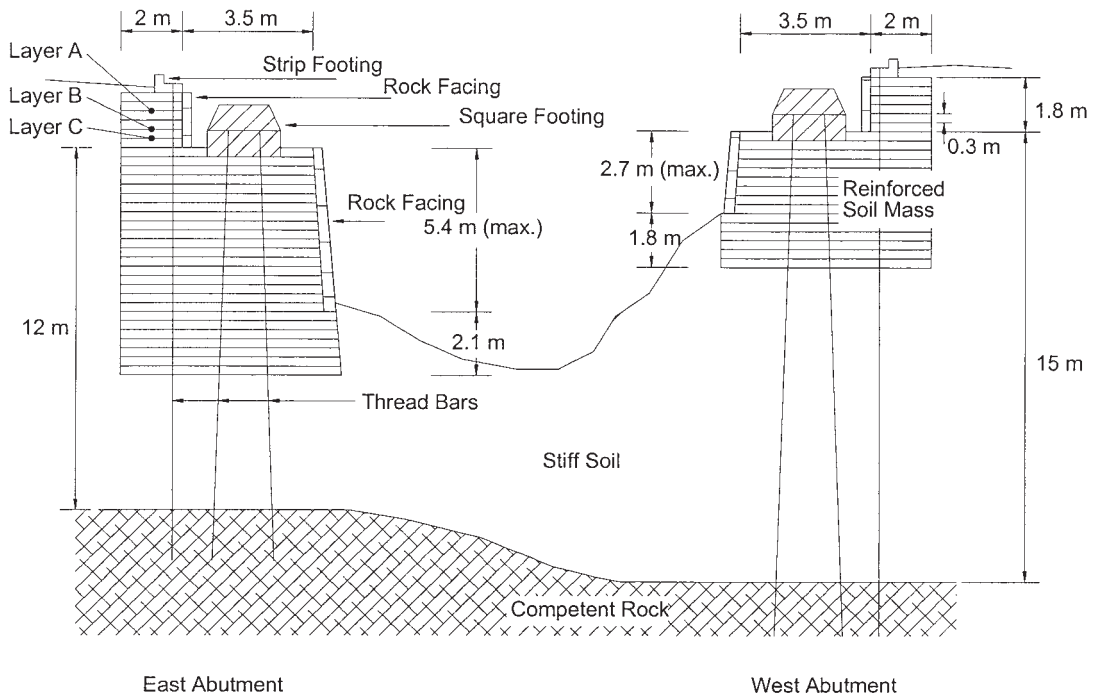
Cross-section of the Black Hawk bridge abutments (Wu et al., 2001).
